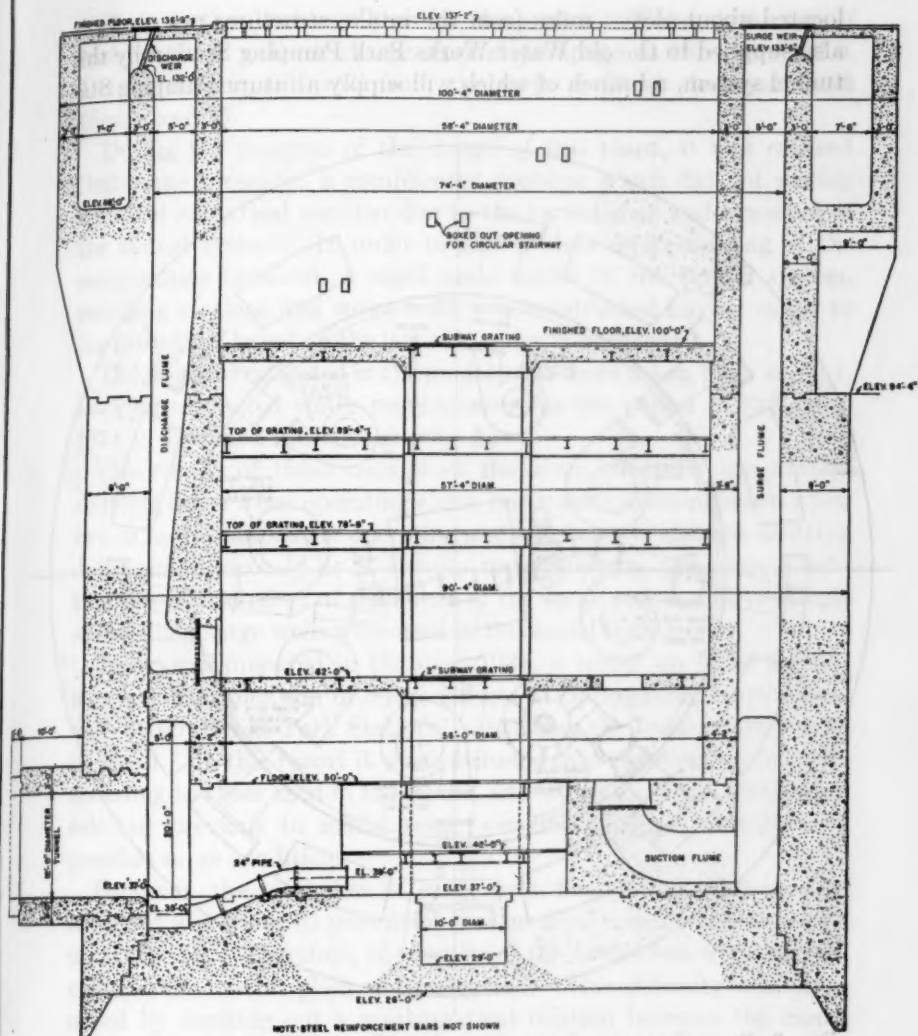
VERTICAL SECTION THROUGH SPRINGWELLS LOW LIFT PLANT
